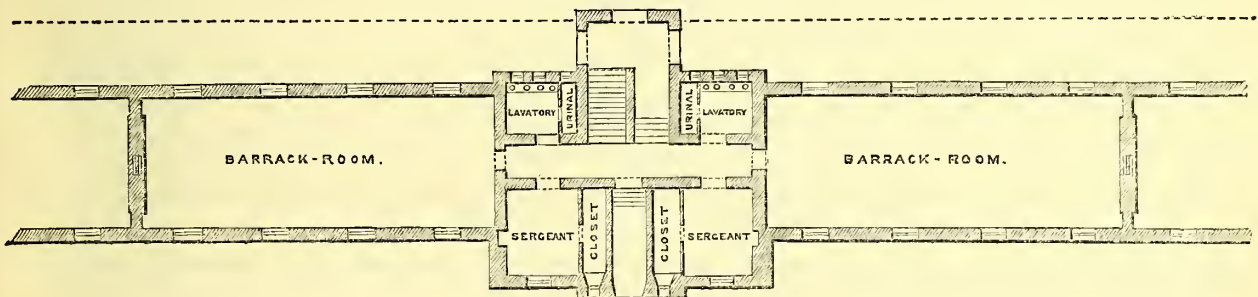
NEW CAVALRY BARRACK, YORK.
